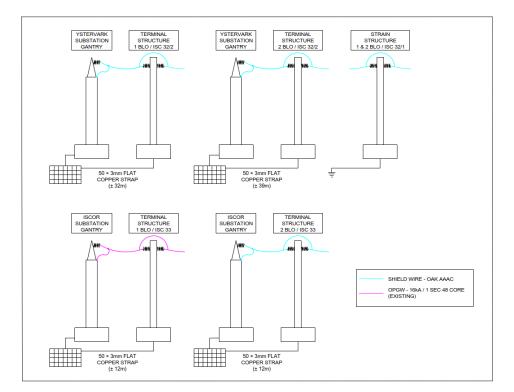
Structure Earthing and Shield Wire/OPGW Gantry Bonding Configurations - Elevation View
